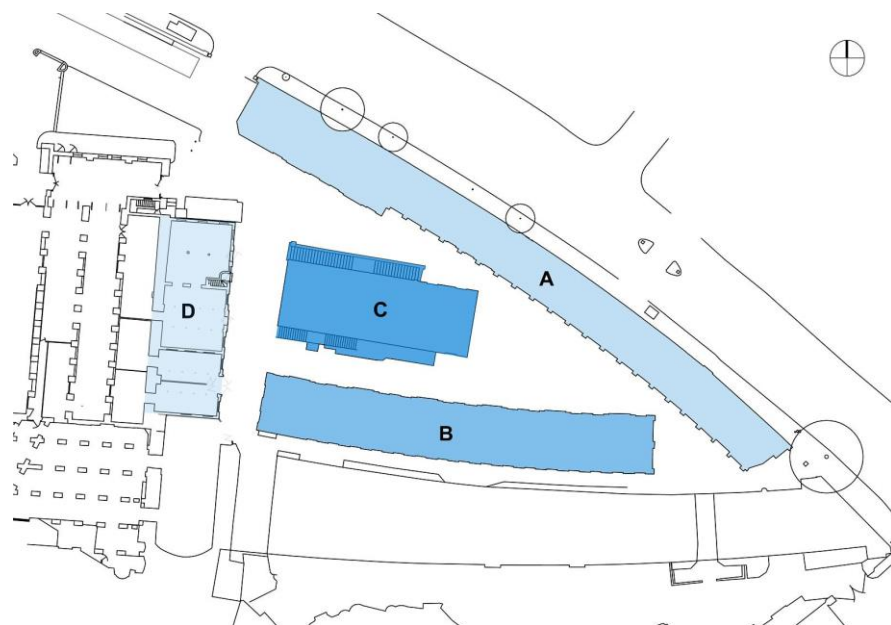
Stables Market - Four western ranges, subject site Buildings A & C.
